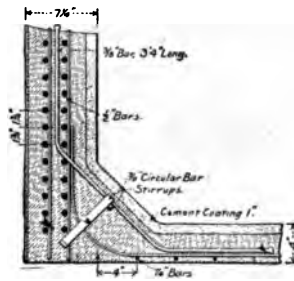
Section of Tank at Bottom Corner, Fort Revere Water Tower.
